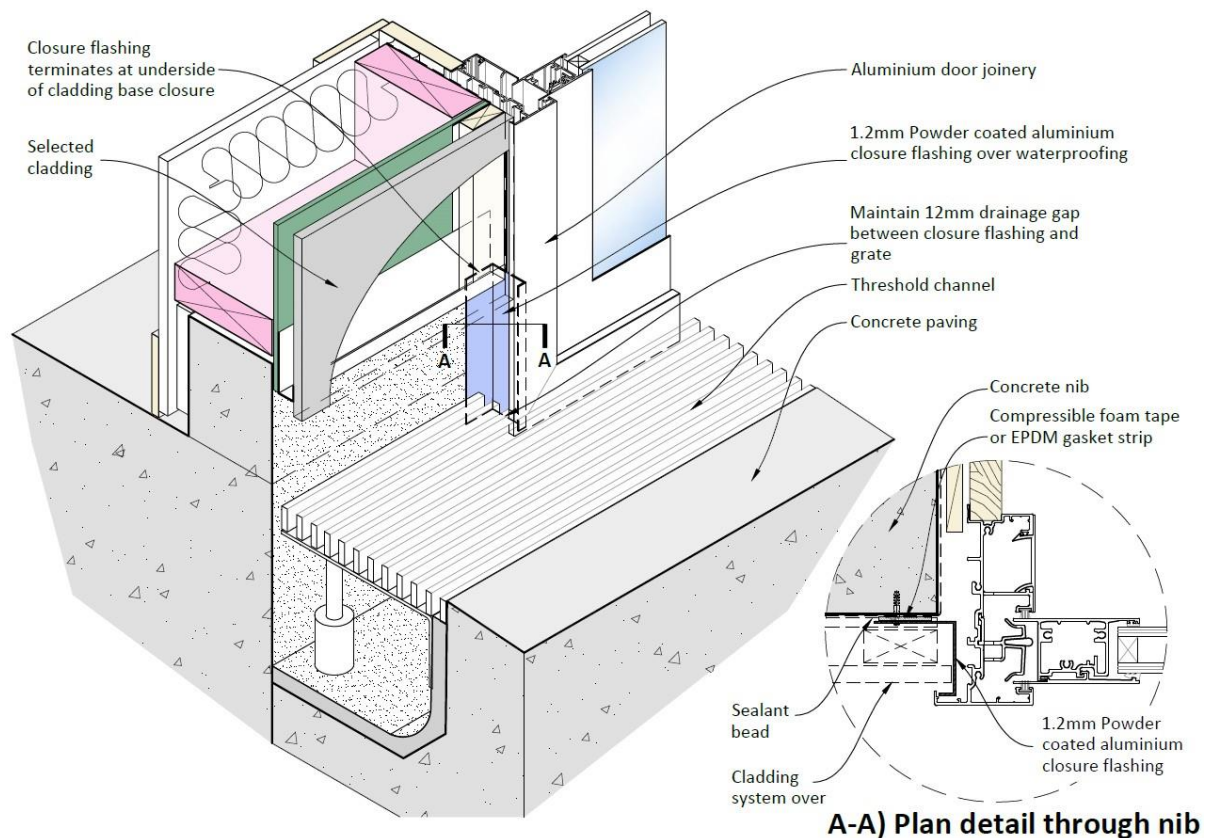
Example of Concrete Nib to Door Frame Junction
